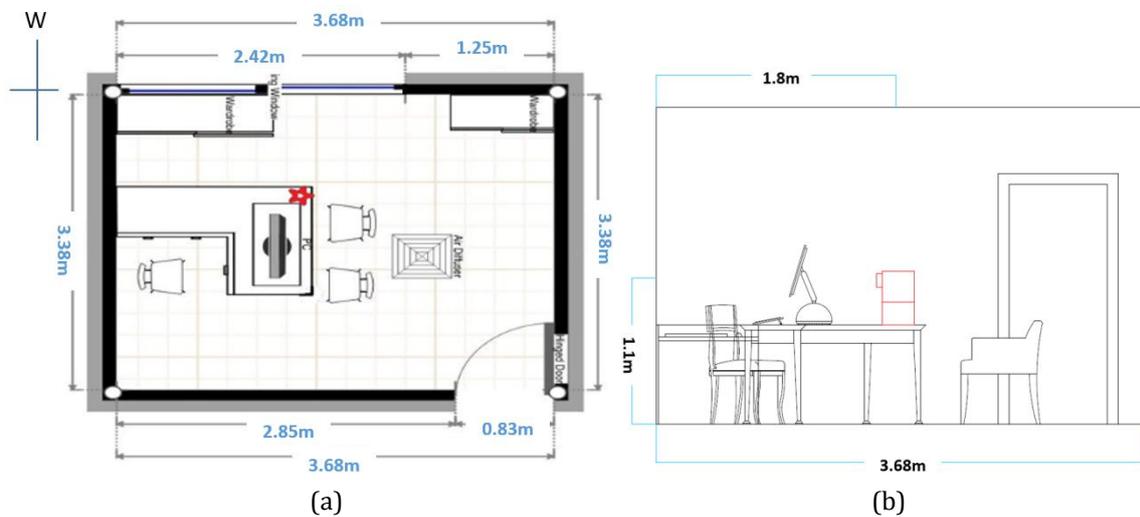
Drawing layout of Private Office in UTeM, (a) Top view, and (b) Side view.
